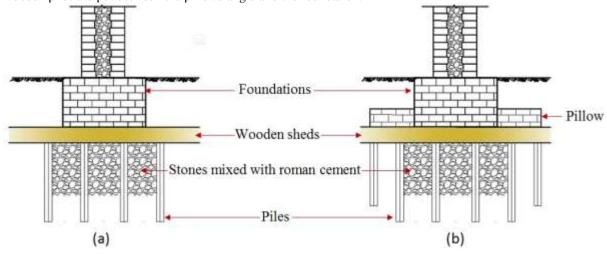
(a) Foundations on wooden sheds over the wooden piles in both length &width, (b) A pillow is based on the wooden piles for strengthening the foundation
